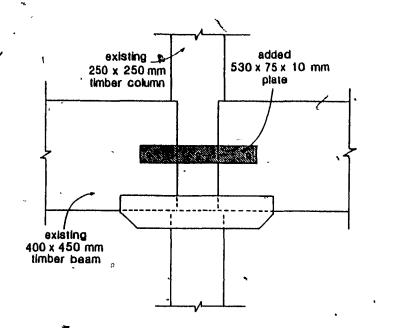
Strengthening of Timber Beam-Column Connections.
